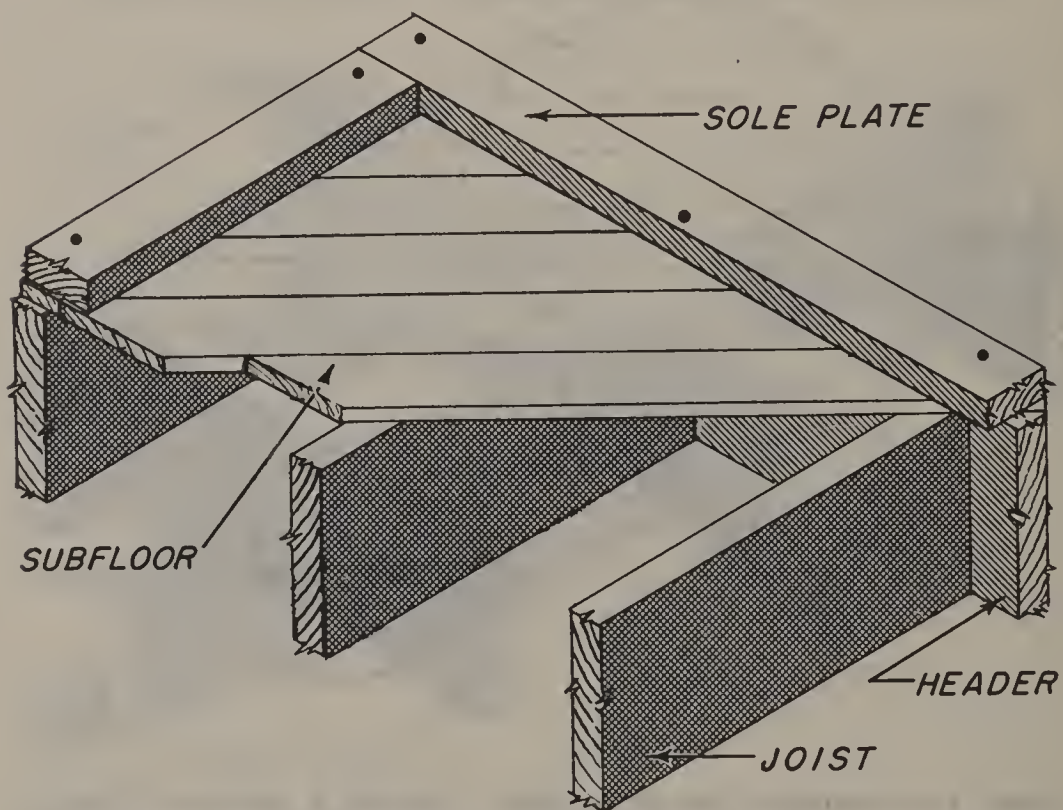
Sole plate. Nailed through subfloor to header joist and joist with sixteenpenny nails staggered. Sole plate over end joist nailed through subfloor to joist with sixteenpenny nails spaced 16 inches on centers. Note: For nailing of plates on which rafters bear, see figures 44 to 46.
